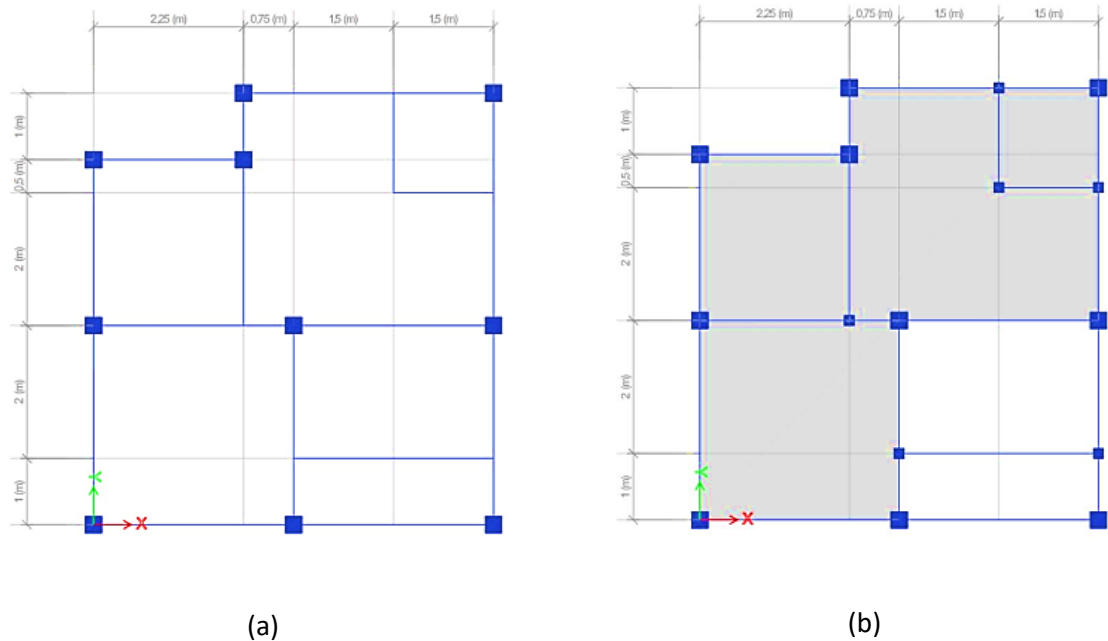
House Floor Plan (Septiropa, 2009) (a) First Floor, (b) Second Floor
